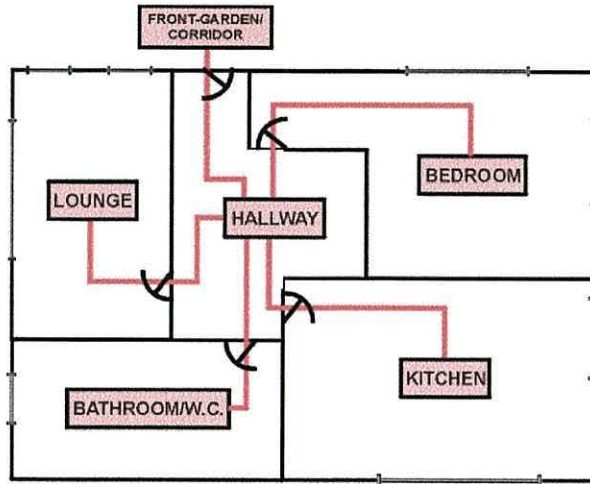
Room floor-plan and connectivity for 'virtual' bungalow.
